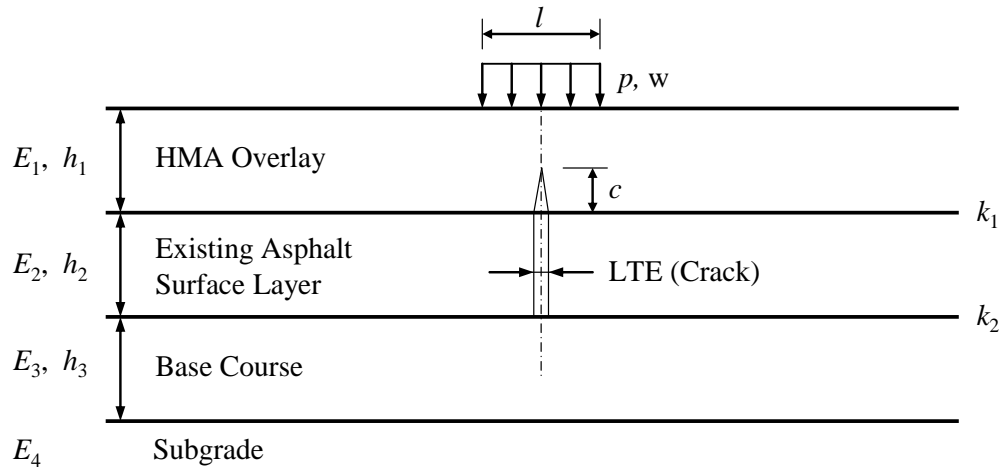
Diagram of HMA overlay on asphalt concrete pavement-bending.
